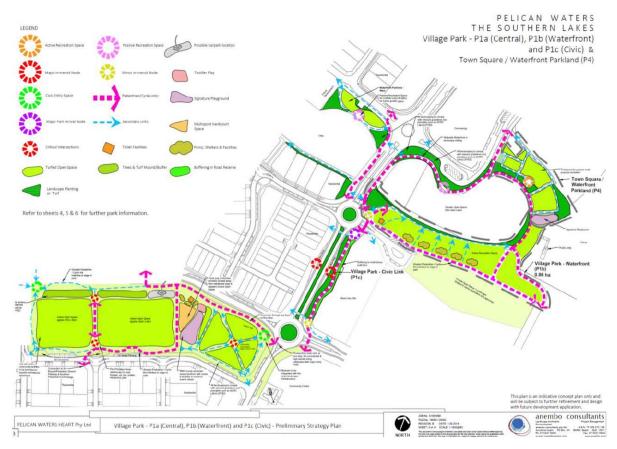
Applicant's proposed detailed strategy plan of amended open space layout
